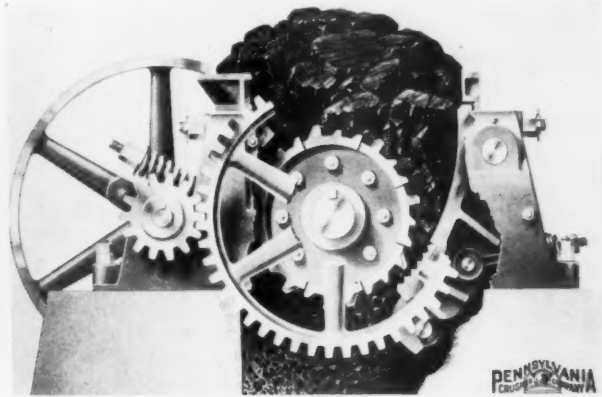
Single-roll coal crusher, showing roll and breaker plate
